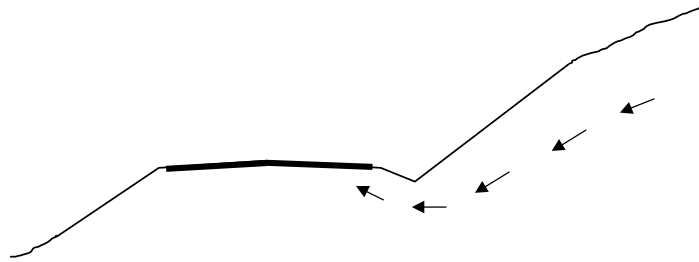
Longitudinal cracking along the pavement edge
